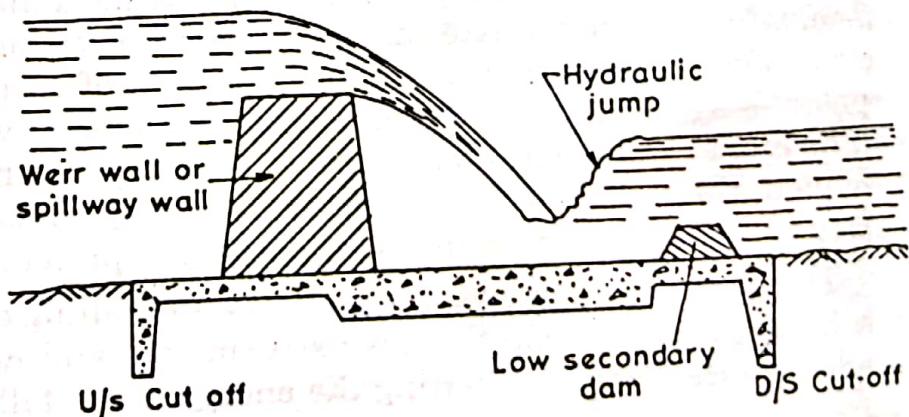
(b) Straight drop spillway with d/s protection works.
